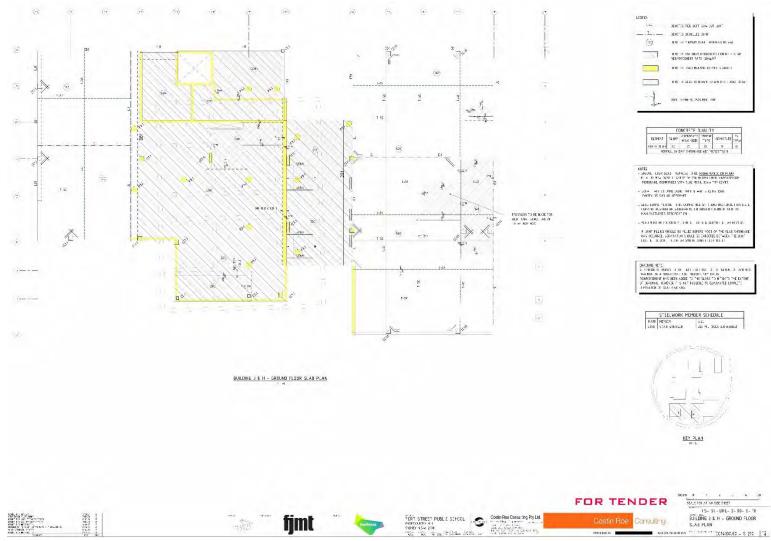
Building J and H ground floor slab plan. (Source: Lendlease, 2021)
